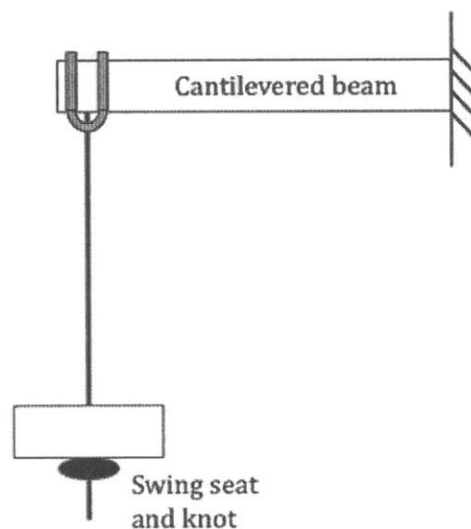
Diagram of swing seat and cable attachment design. The swing is attached to the cantilever beam by a u-bolt to prevent swing cable from chafing wood.
